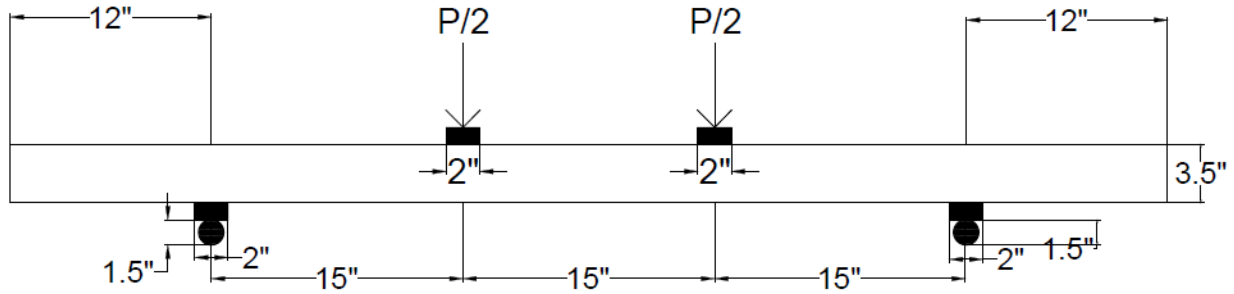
Schematic of test setup for cyclic loading test (1 inch=25.4 mm)
